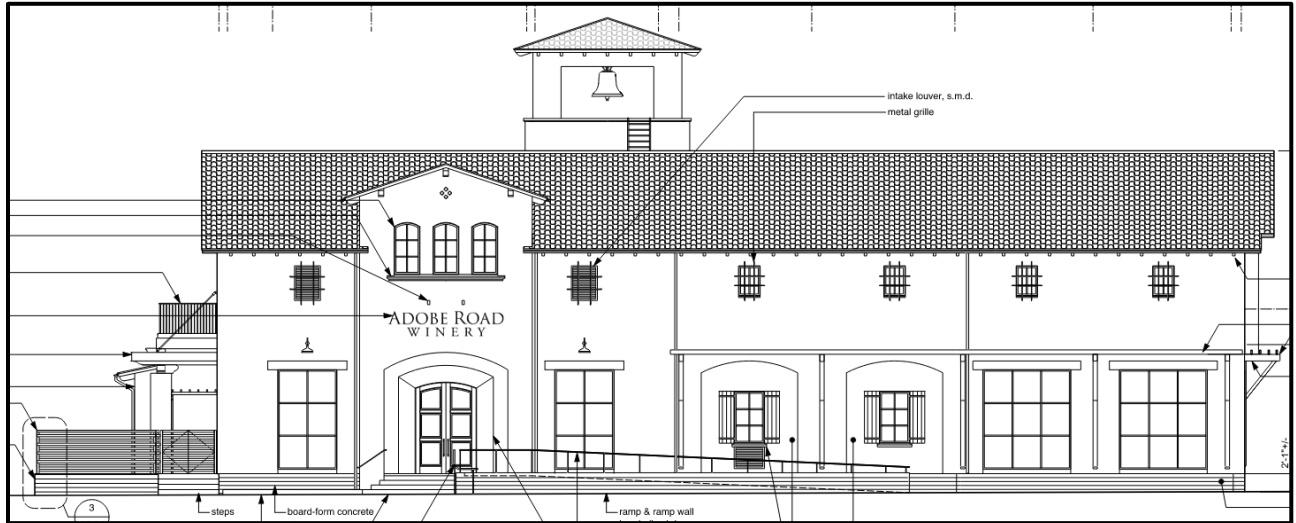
C Street Elevation – Approved (Attachment F, Sheet A3.01)
